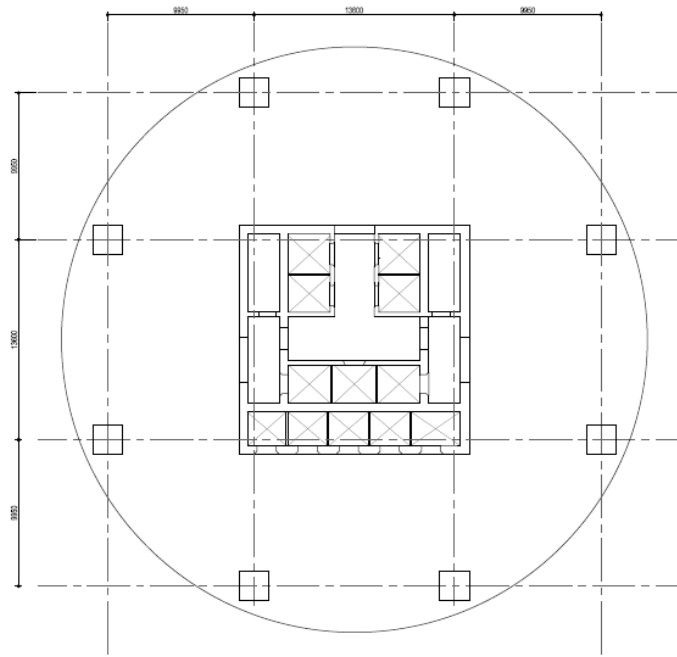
Layout of structural floor plan from Level 9-Level 55
